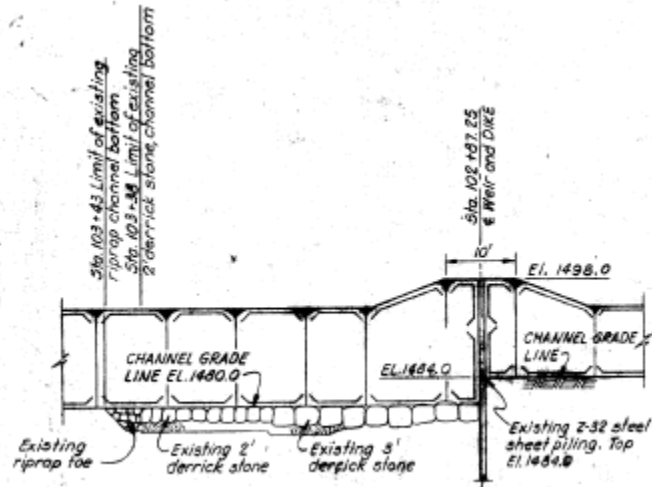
Steel Sheet Pile Weir Cross 1600 Feet Upstream of W.A. &G. bridge
